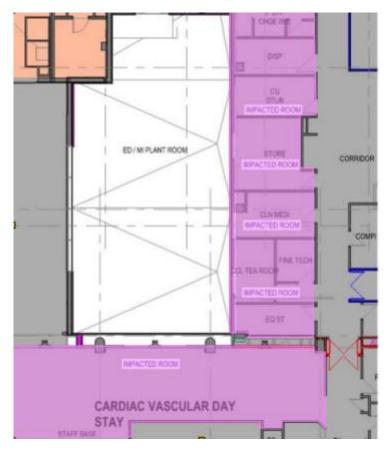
Rooms where natural light will be impacted by the proposed plant room.
